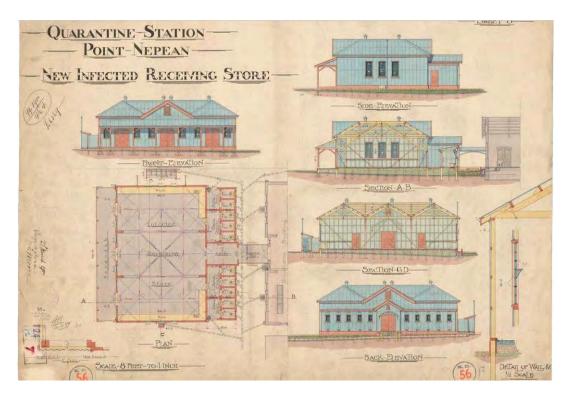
New Infected Receiving Store. Contract Drawing. Sheet 3. Drawing dated 14 November 1899. Note the plan indicates there were toilet blocks to both the southwest and northwest corners of the structure. These originally were divided from the main building by an open form lobby. The plan also indicates the building was clad in vertical iron sheeting. Source: National Archives of Australia.
